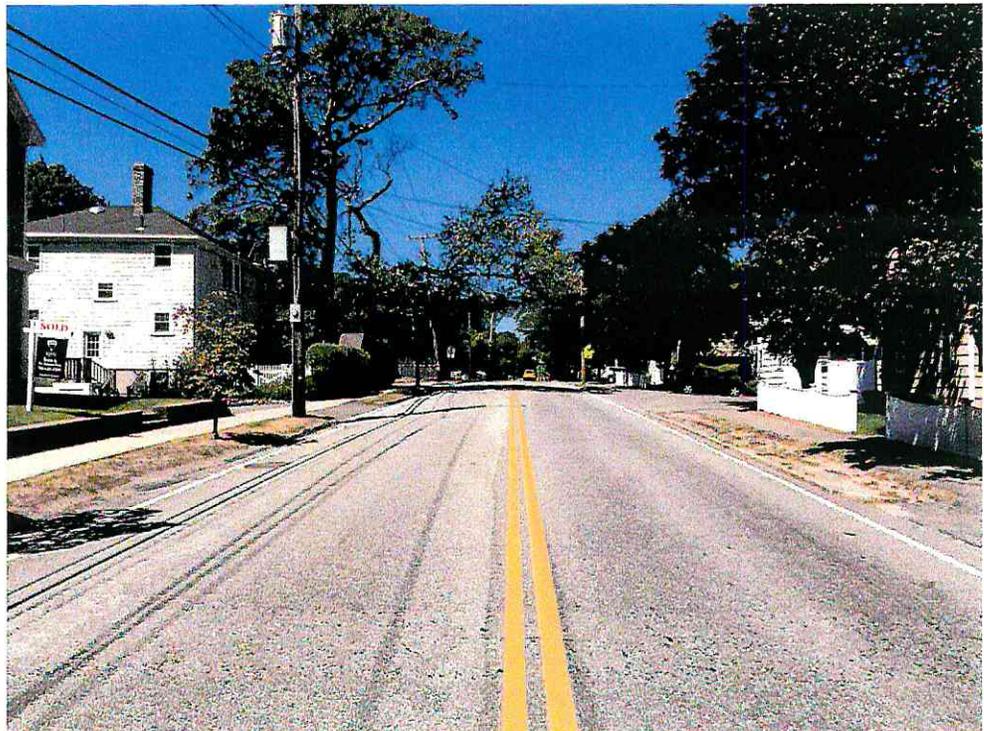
Location h – Cross St. looking west. 125' east of Loring Ave.
